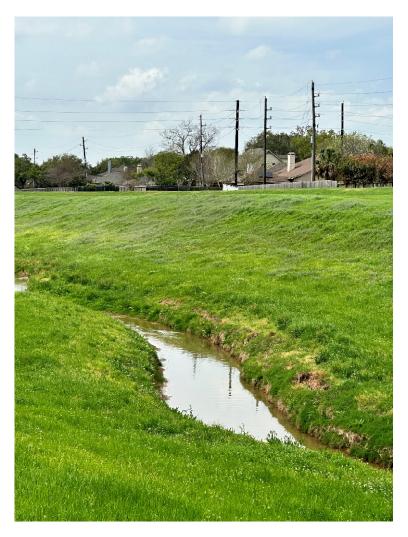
Point of Discharge into Rabs Bayou looking west.
